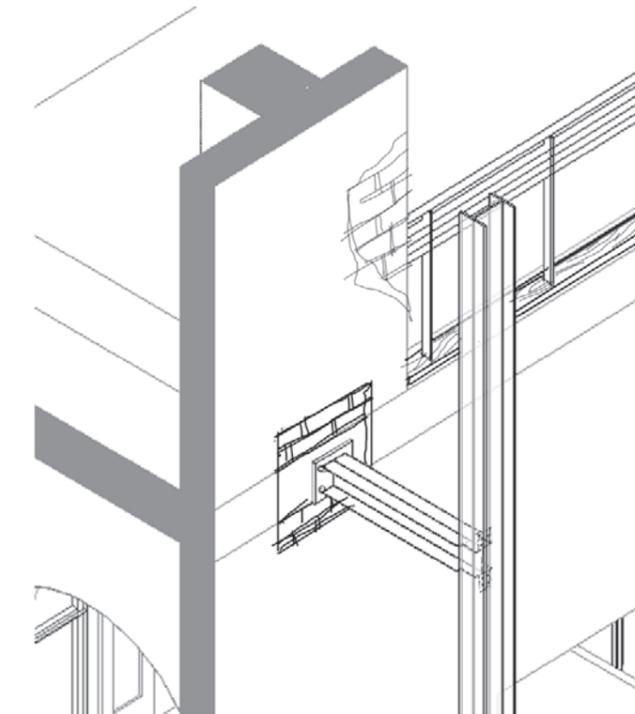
Revit sketches: detail that shows the structural support between old and new (Author 2013)
